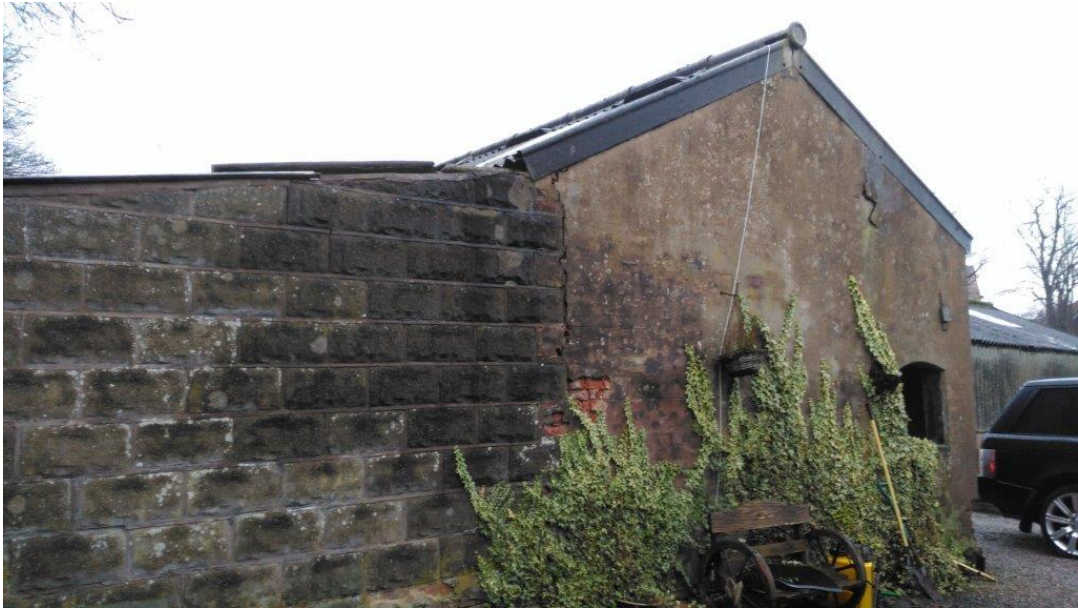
Crevices at top of north wall showing broken roof which is likely to cause water to drain down into the wall
